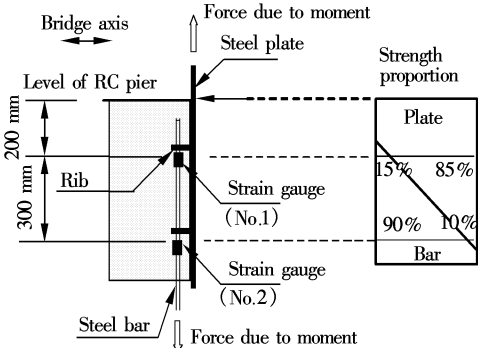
Reinforcement bars in RC pier and proportions of forces in bars and plates
